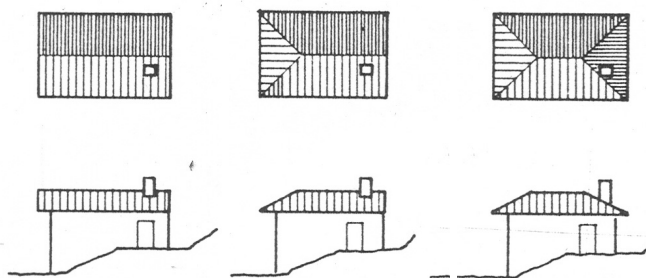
Roof types in the vernacular houses (double-pitched roof, triple pitched roof, quadruple pitched roof) (5).
